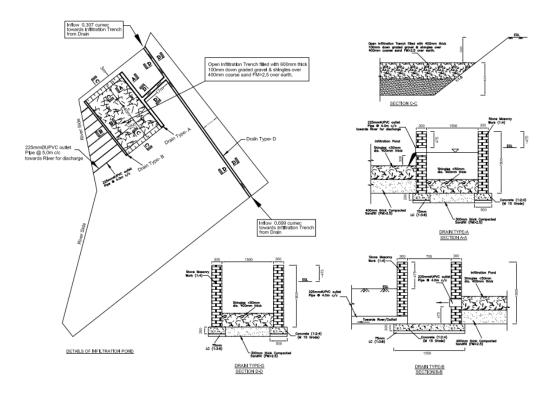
Typical design of infiltration trench for stormwater quality prevention
